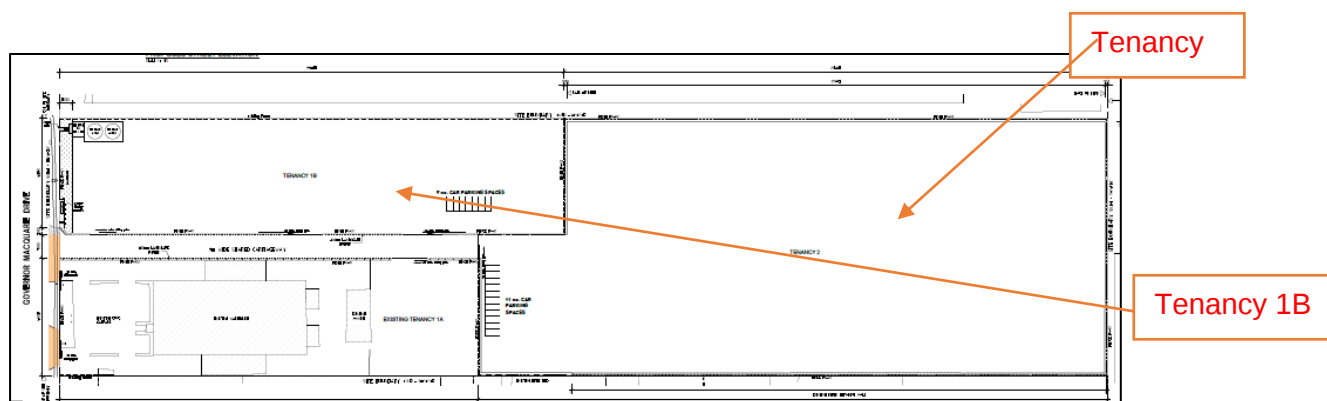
Architectural Site Plan (Source: Concept Y Architects 2024)
